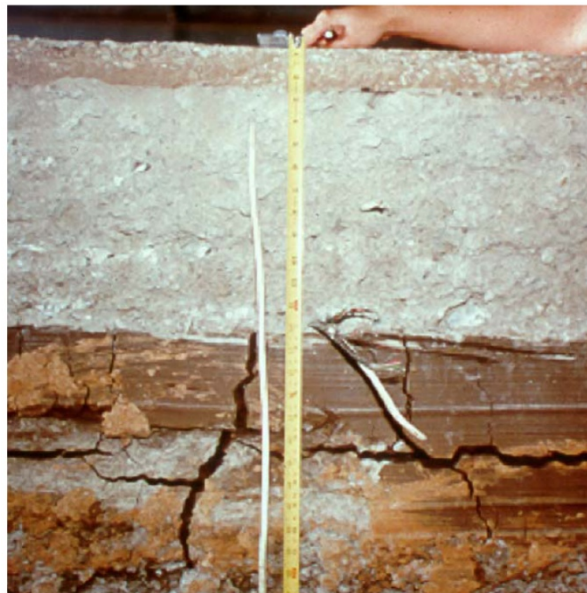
Dry-Land Cracking Initiated in Subgrade (Luo and Prozzi 2008)
